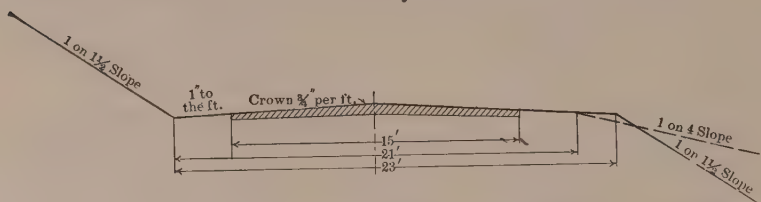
Standard Road Section. Massachusetts Highway Commission.
